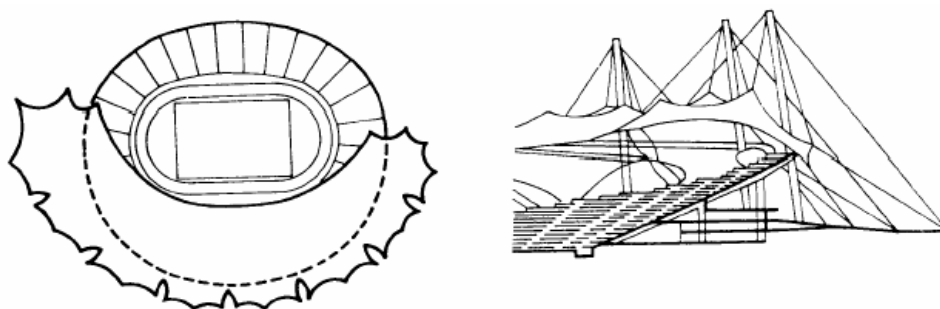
Ground section and cross section of the Olympic Stadium in Berlin, 1972 [38]
